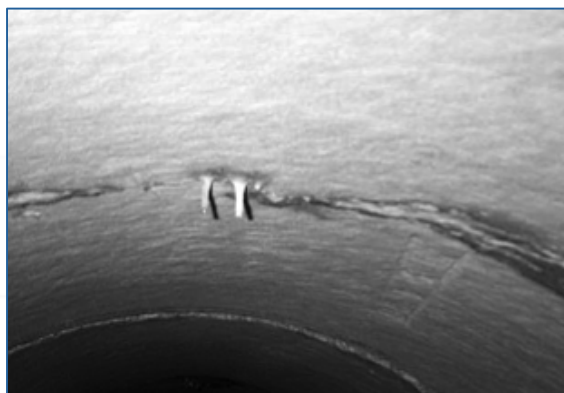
Autogenous Healing of Circumferential Shrinkage Crack
